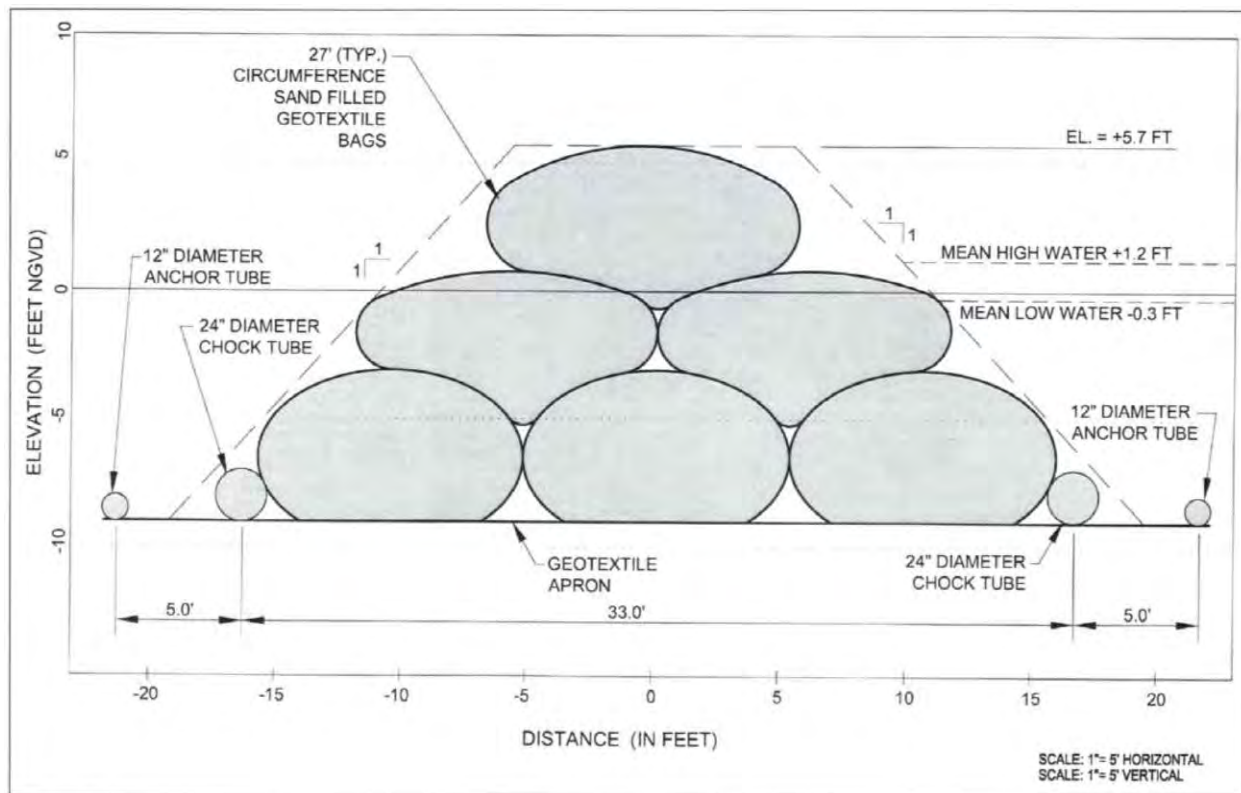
Cross-sectional view of typical groin used in Upham Beach construction; cross-sectional area = 52 sq. ft. each (source: Elko and Mann, 2007)
